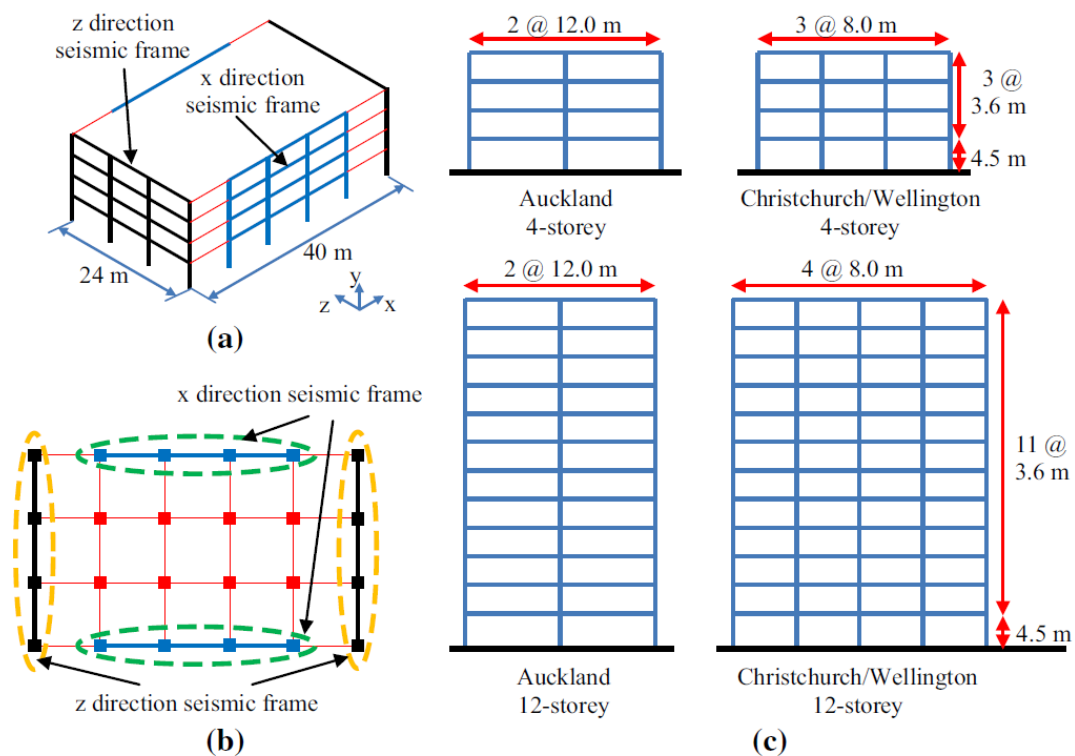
Case study buildings 1 and 2; (a) example of 4-storey isometric view, (b) example of plan view, and (c) frame elevations (modified from Yeow et al. 2018).
